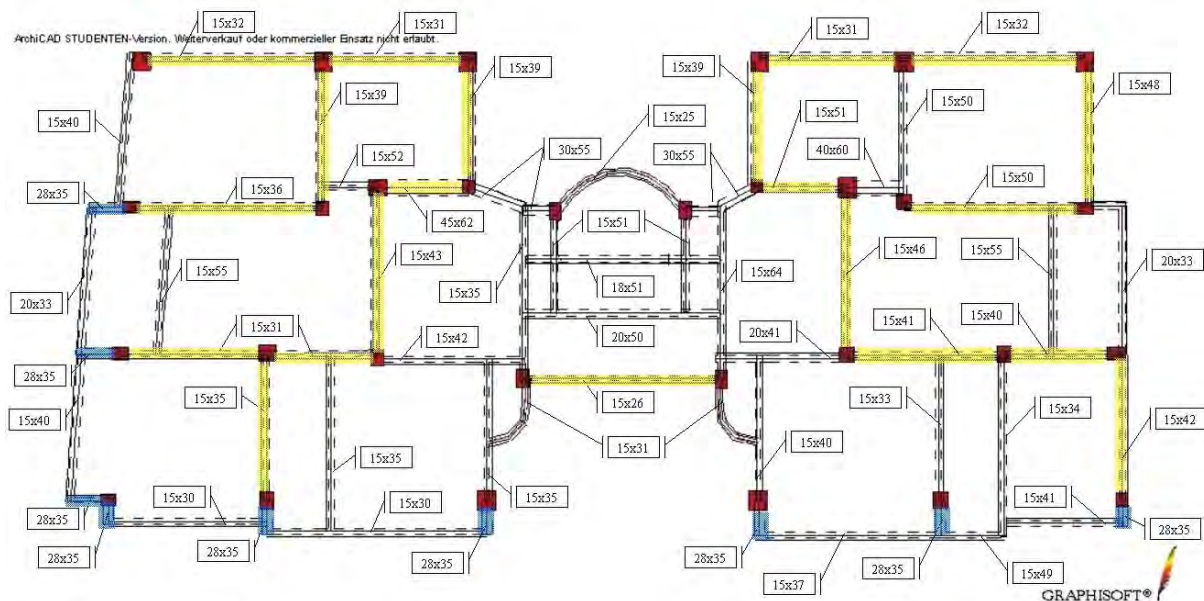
Layout of beams and columns in a typical building. Note that only few (the yellow ones) form frames.
